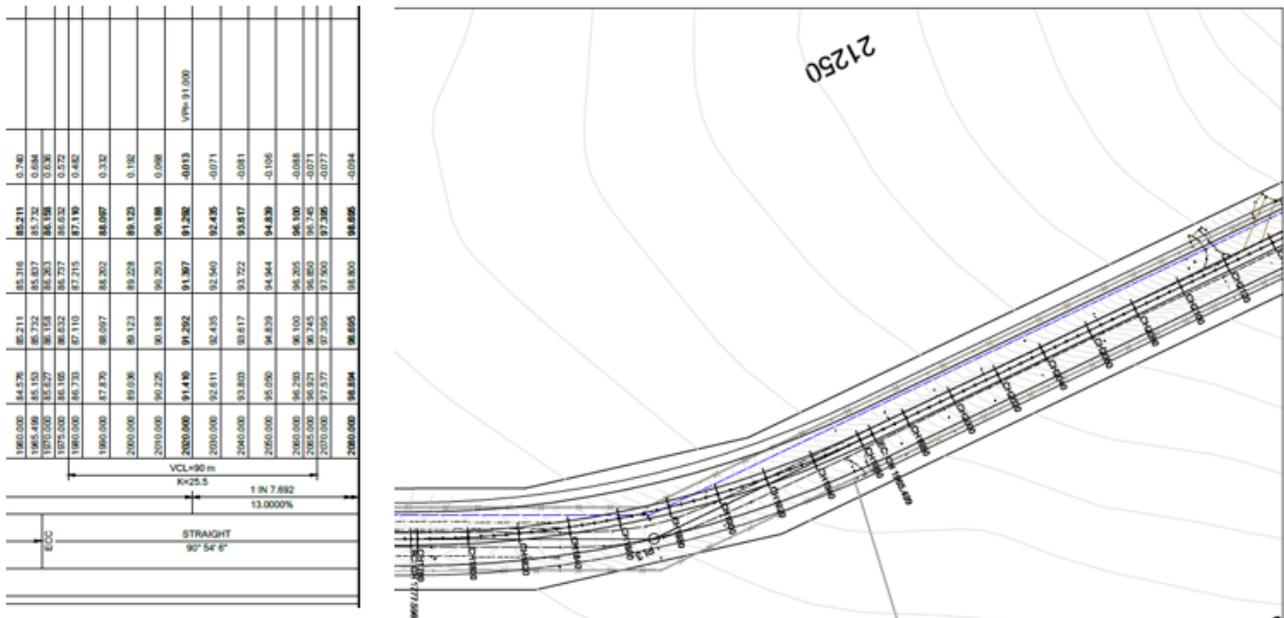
Longitudinal Slope of Aalwyn Road next to Erf 23731
